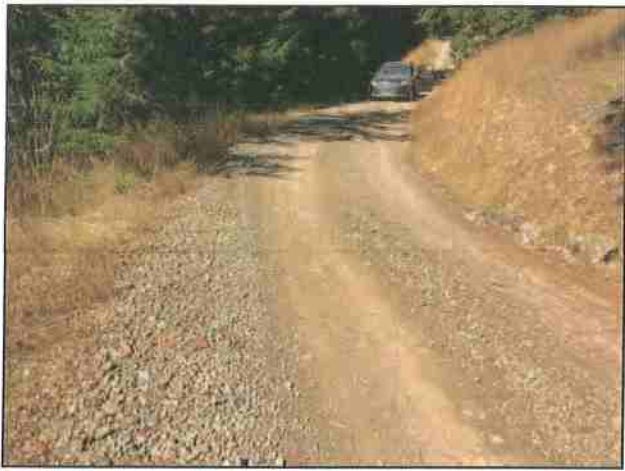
Private Access Rd @ Curve w/ Turn-out Looking SW
